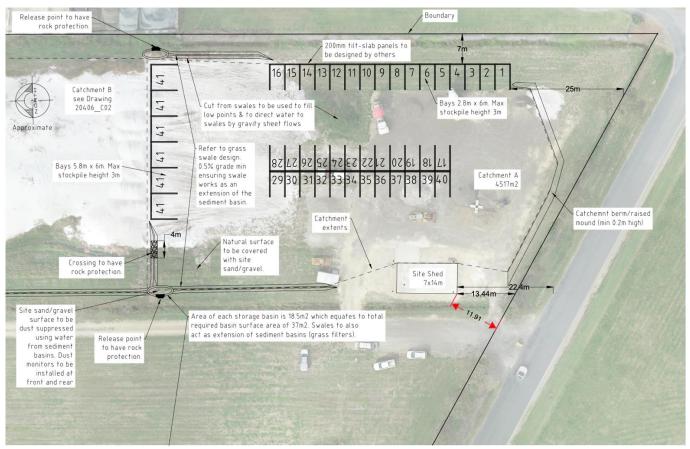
Site Layout Plan (Source: Greg Alderson & Associates) -This plan covers part of the site – refer to Figure 1 for the aerial photograph which shows the extent of the site
